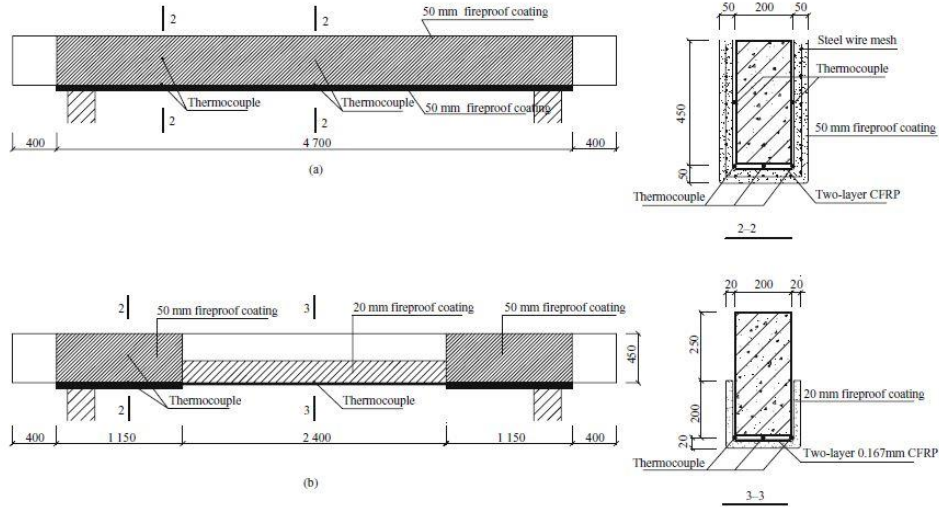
Insulation system for CFRP-concrete beams (a) L1 and (b) L2
